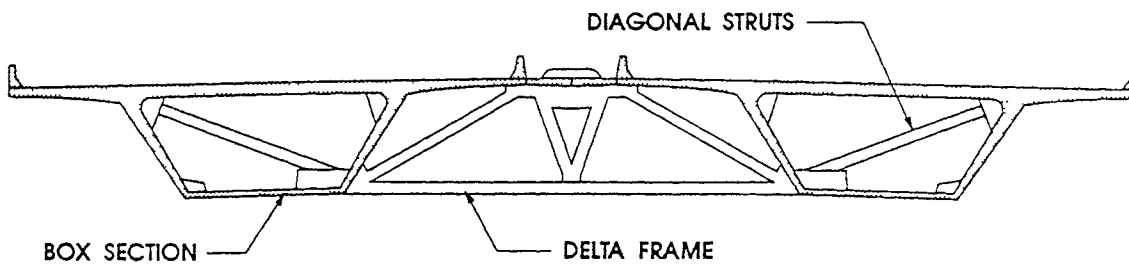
Cross Section of Twin Box Girder Showing a Typical Delta Frame.
